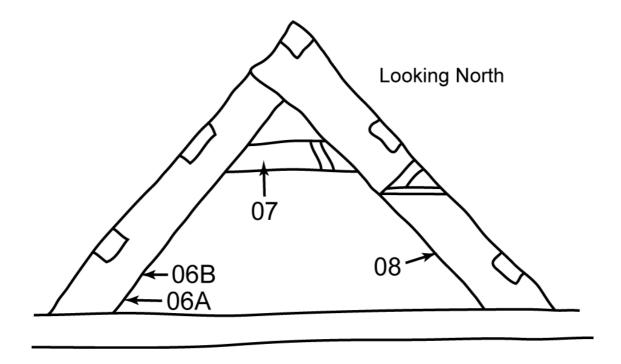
Sketch of truss 2, viewed looking north, showing sample locations
